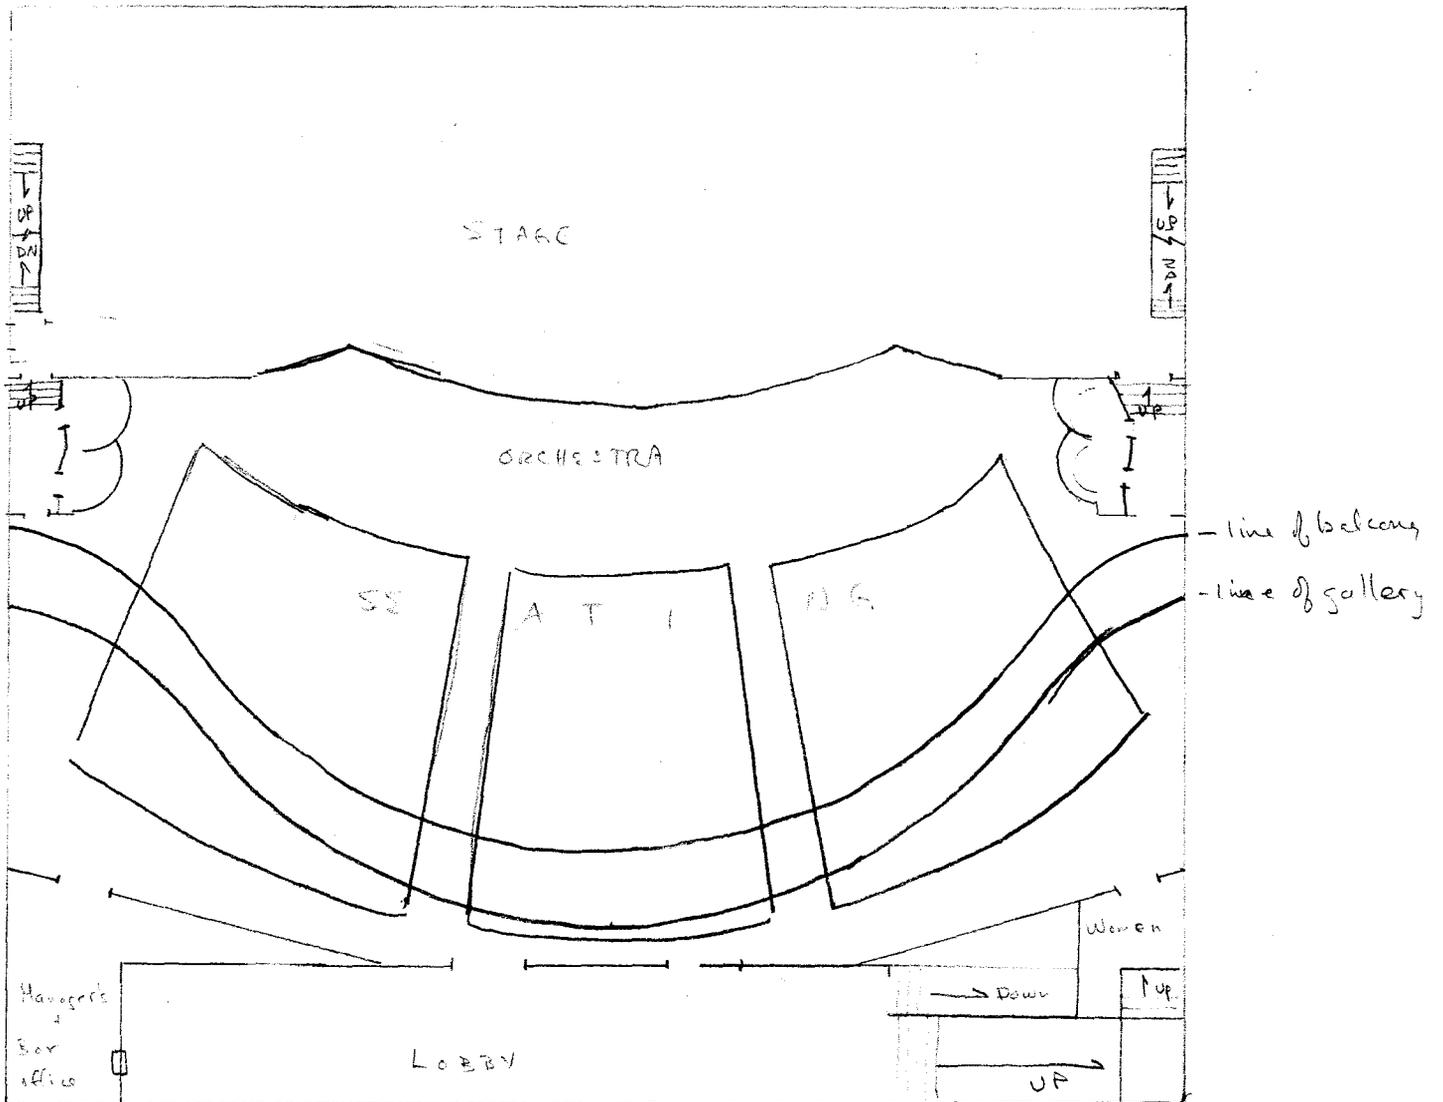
Sketch of theater basement floor plan, ca. 1975.
